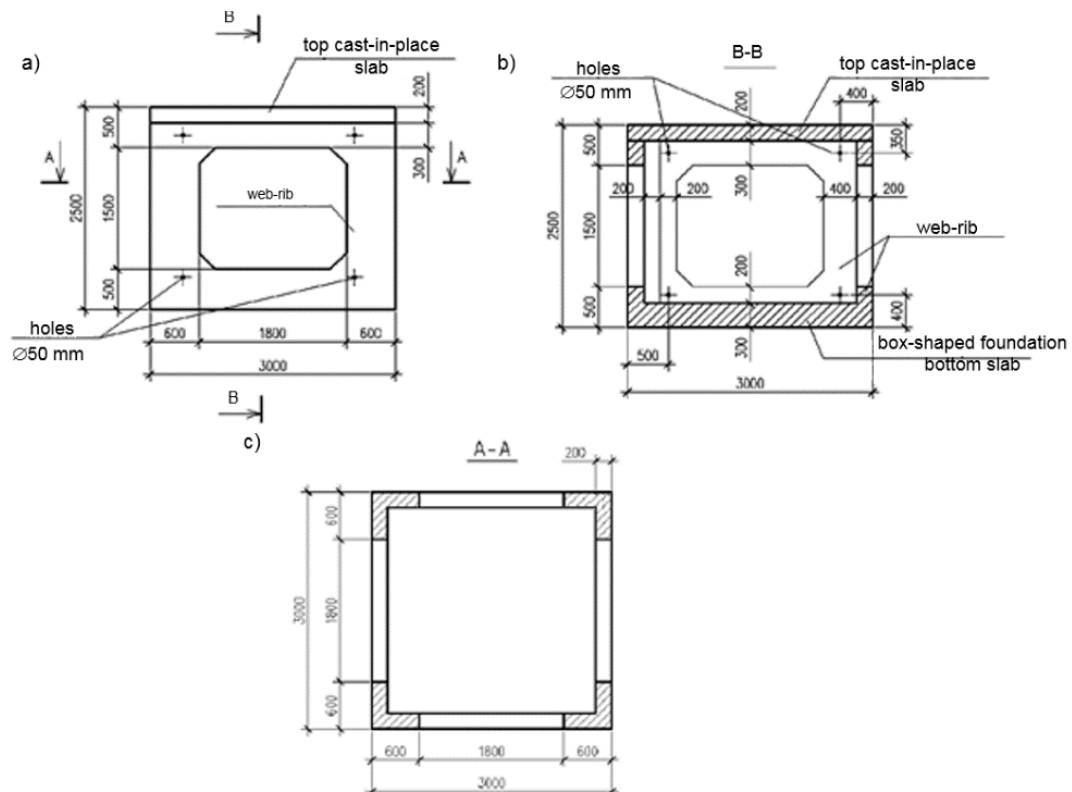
Three-dimension foundation: a – elevation; b – section A-A; c – section B-B.
